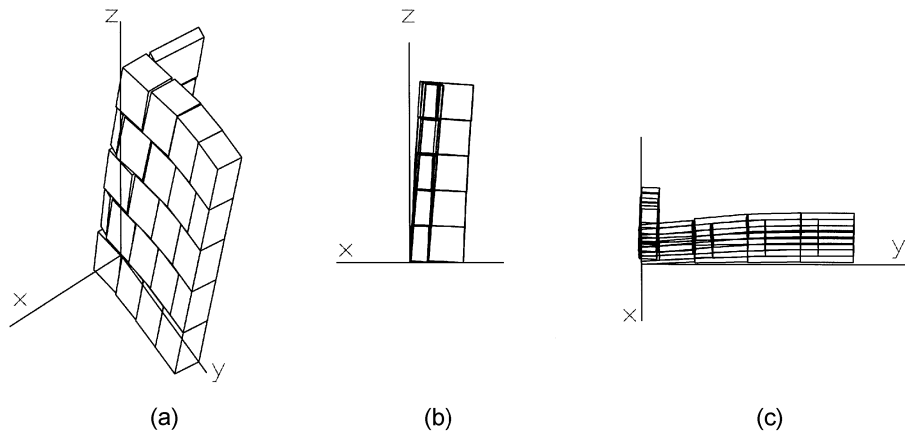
3D failure behaviour of intersecting walls under inclined body force: (a) Axonometric view; (b) Section; (c) Plan
